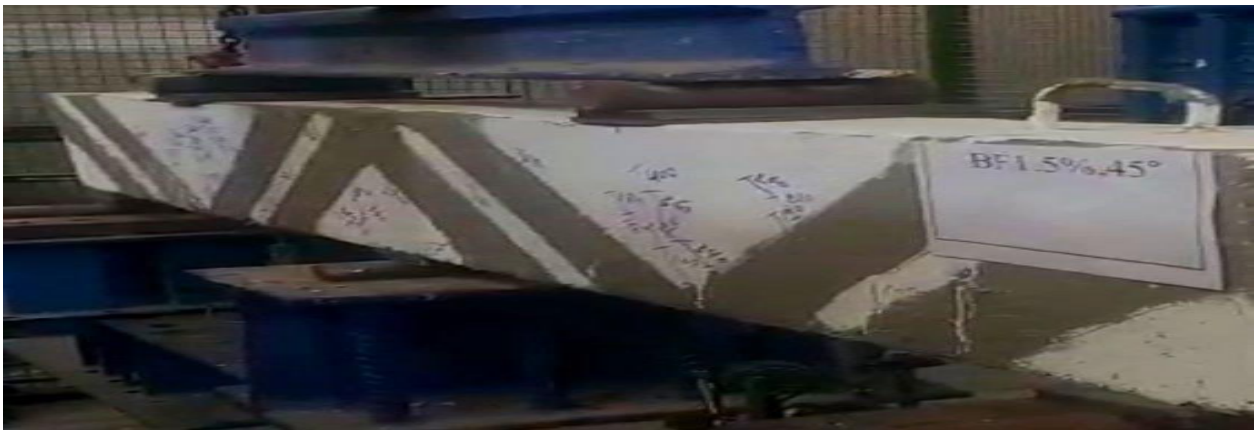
Cracks pattern after failure for (BF1.5%,45°) beam
